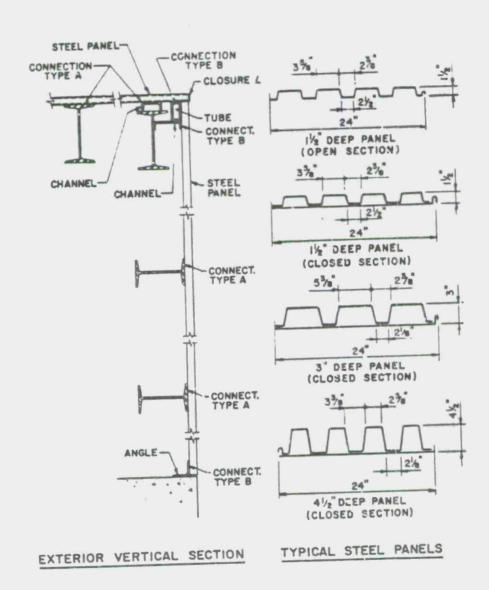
Typical details for cold-formed, light gage steel paneling
